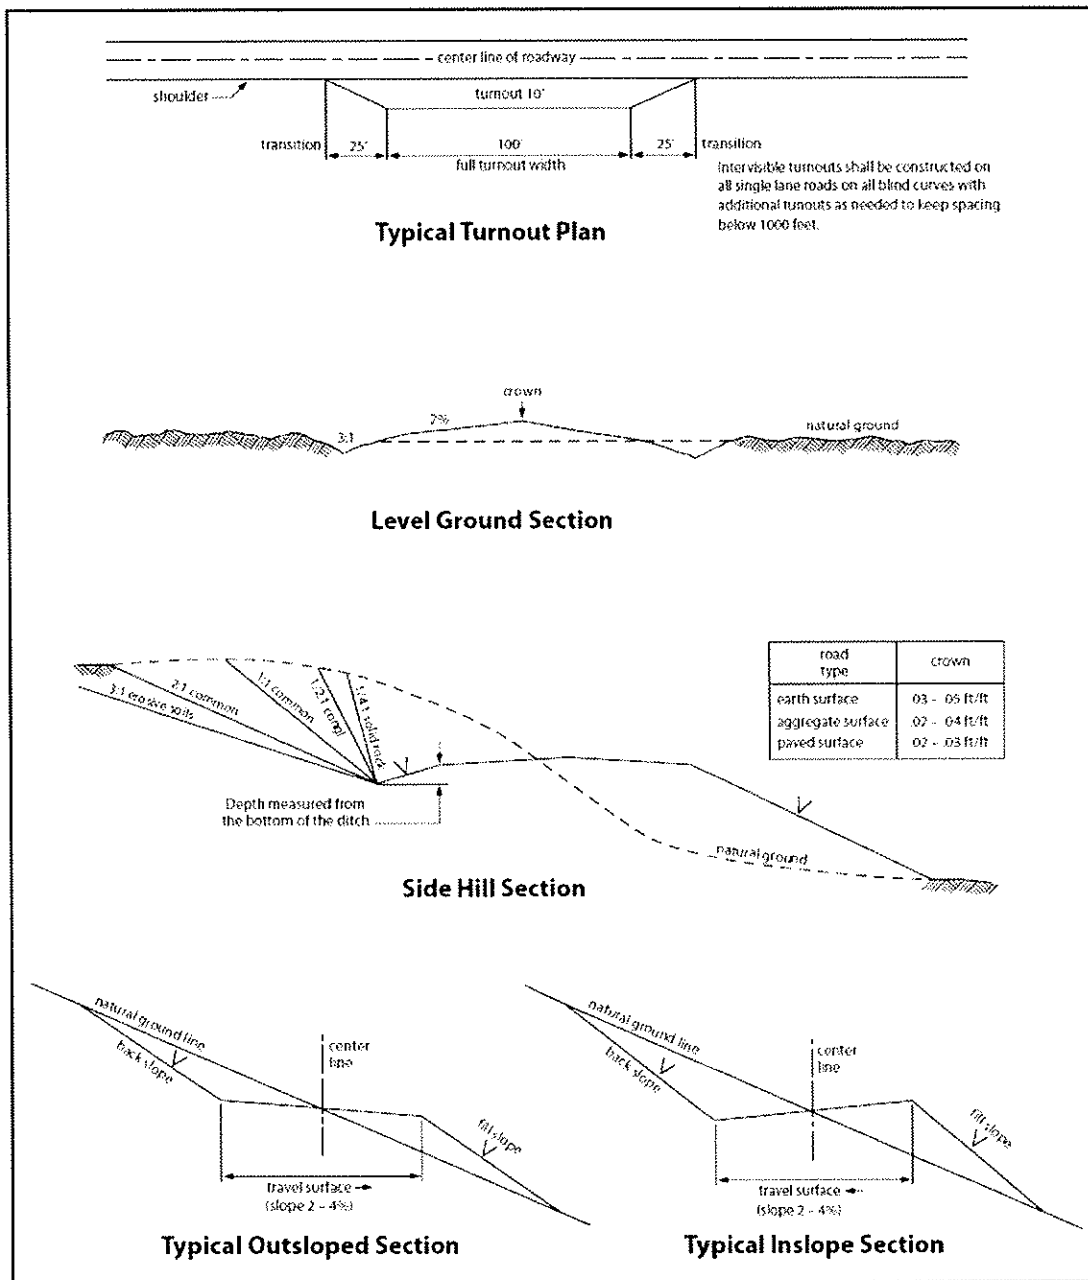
Typical road cross sections (BLM and U.S. Forest Service 2007).
